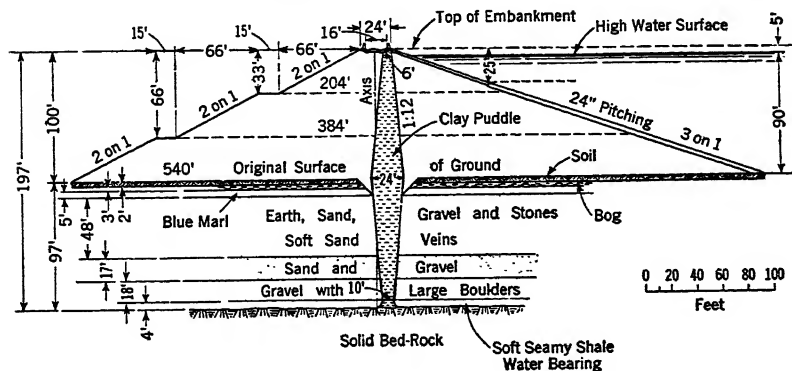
Yarrow Dam (England); typical cross-section showing puddle core. (From "Earth Dams," by Burr Bassil, Eng. News Publishing Co., N. Y., p. 10, 1907.)
